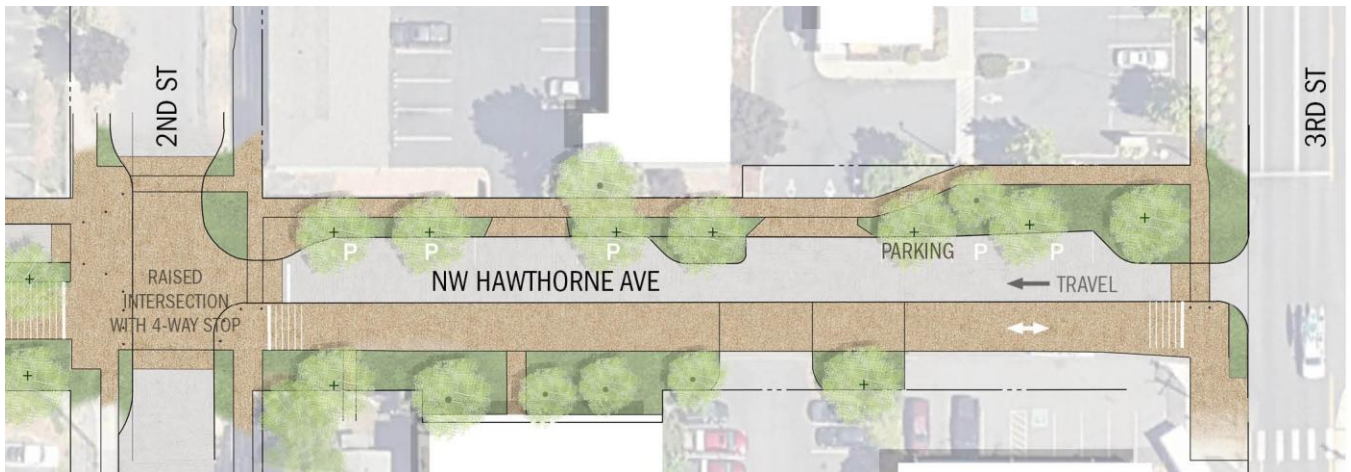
PROMENADE STREET CONCEPT FOR HAWTHORNE AVENUE BETWEEN 2ND STREET AND 3RD STREET
